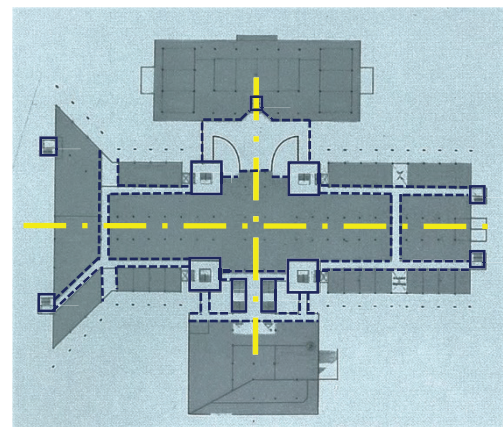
Floor plan of city hall (1967) (Marques da Silva Foundation, RHF archive, adapted by the author)
